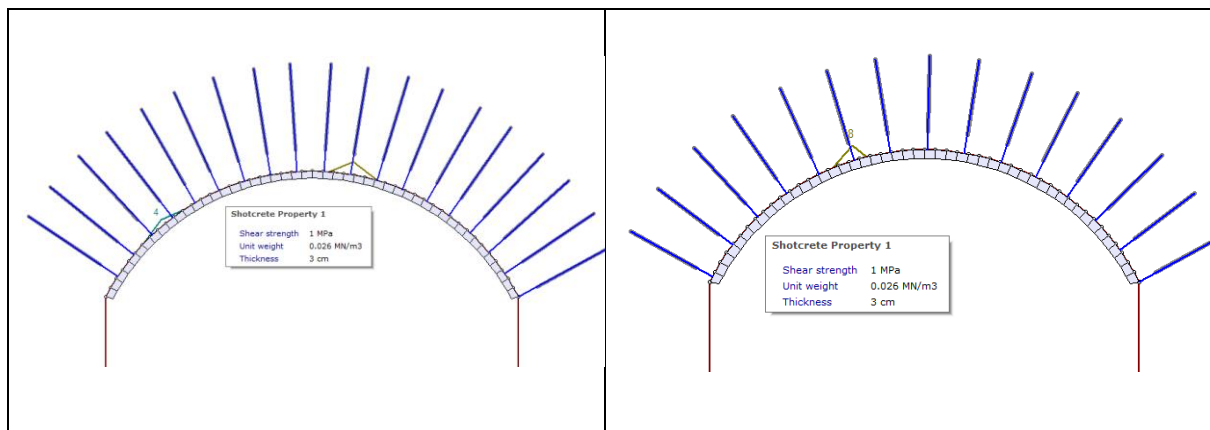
Shotcrete detail used in Original Alignment N55°E (Left) & Alternative Alignment N20°E (Right)
